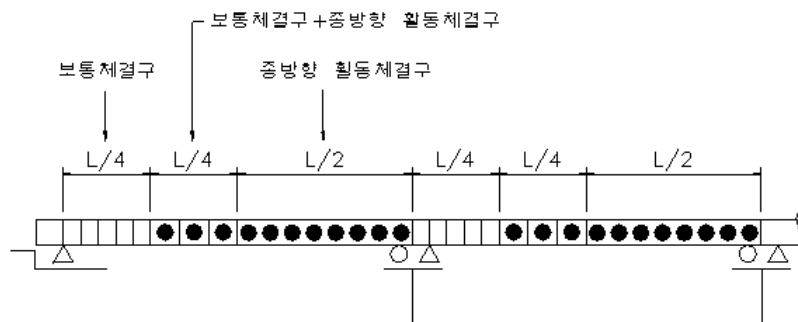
Layout of fastener placement in general and zero longitudinal restraint (ZLR)
